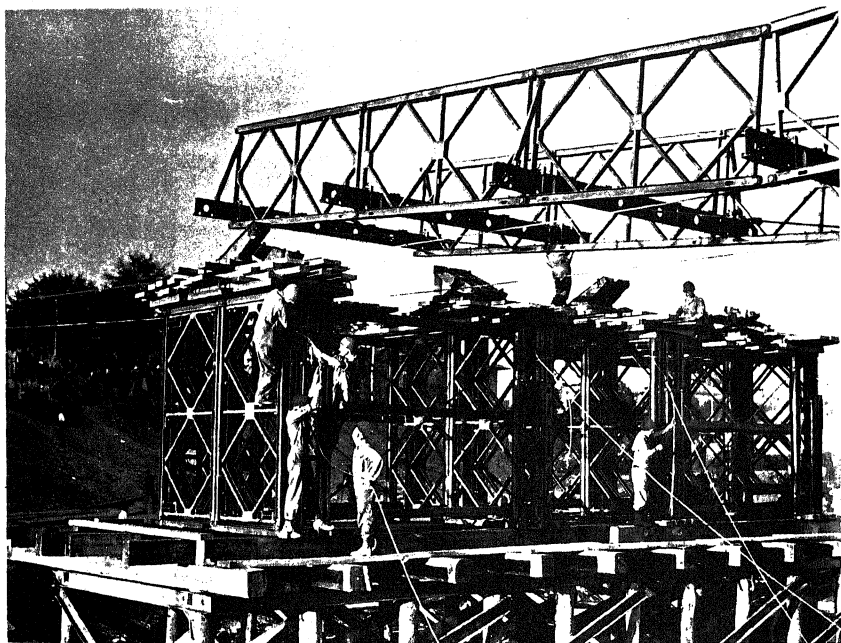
Rocking rollers in position on top of panel crib pier before launching bridge.
